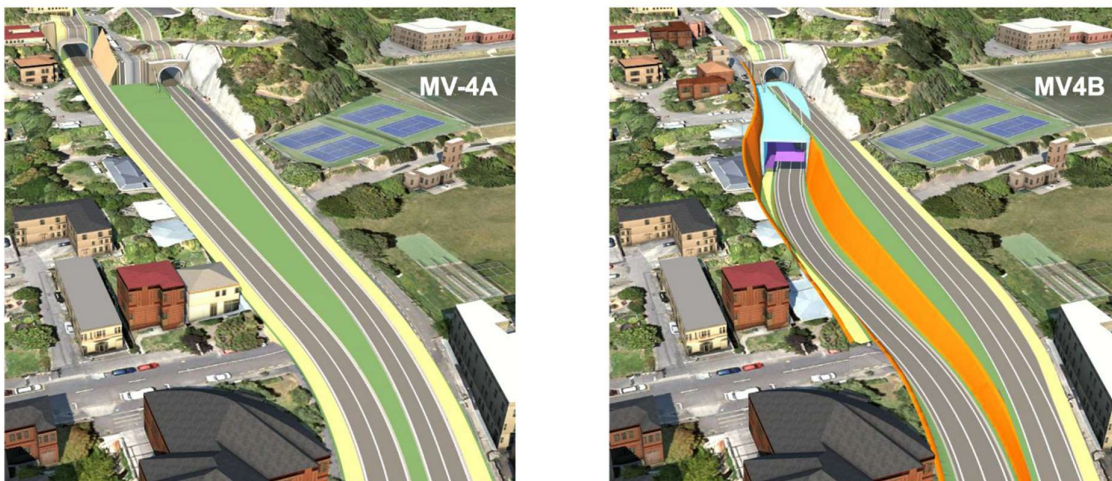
Mt Victoria Tunnel Stacked Tunnel Options
